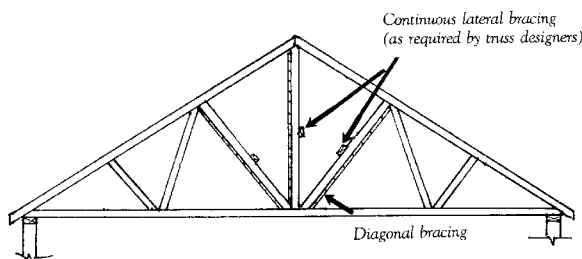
Diagonal bracing in the plane of the web members prevents lateral movement. The diagonal braces are typically arranged in a crisscross fashion.
